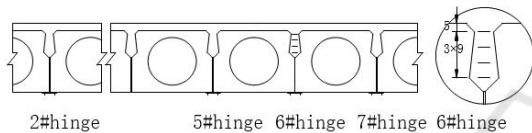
Hollow slab joint strain measurement point arrangement (unit: cm)
